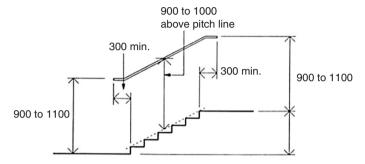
Handrails to internal steps, stairs and ramps – key dimensions (mm)
